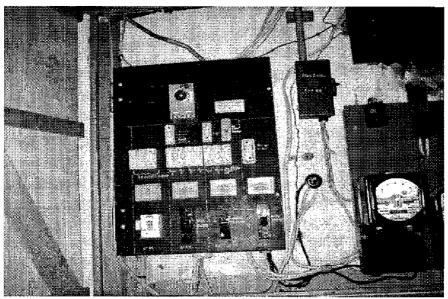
Example of a bituminous backing board suspected of containing asbestos located throughout the properties.
